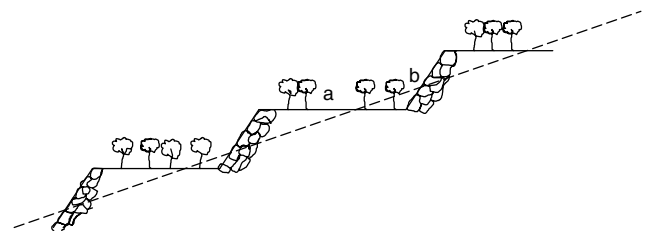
Cross section of bench terraces: a—level bench; b—riser.
